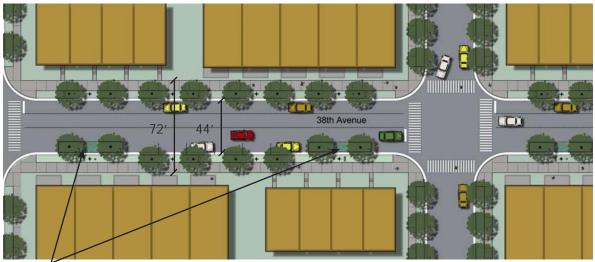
Residential Road Diet Conceptual Plan. This plan shows the residential road diet design with properties that have been developed with new residential uses. Onstreet parking would not be provided near the intersection of Harlan Street, where bus pullouts and right-turn lanes are recommended by the road diet traffic analysis.
